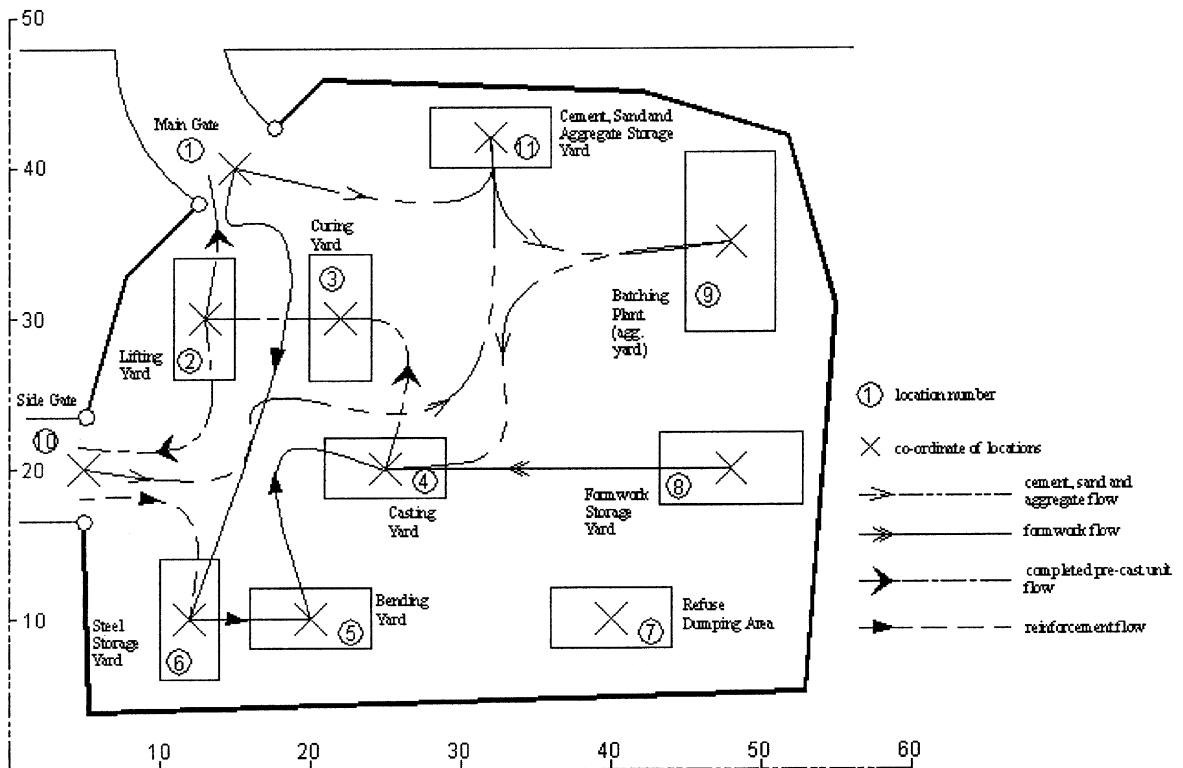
Site pre-cast yard layout arrangement plan for the near optimal solution.
